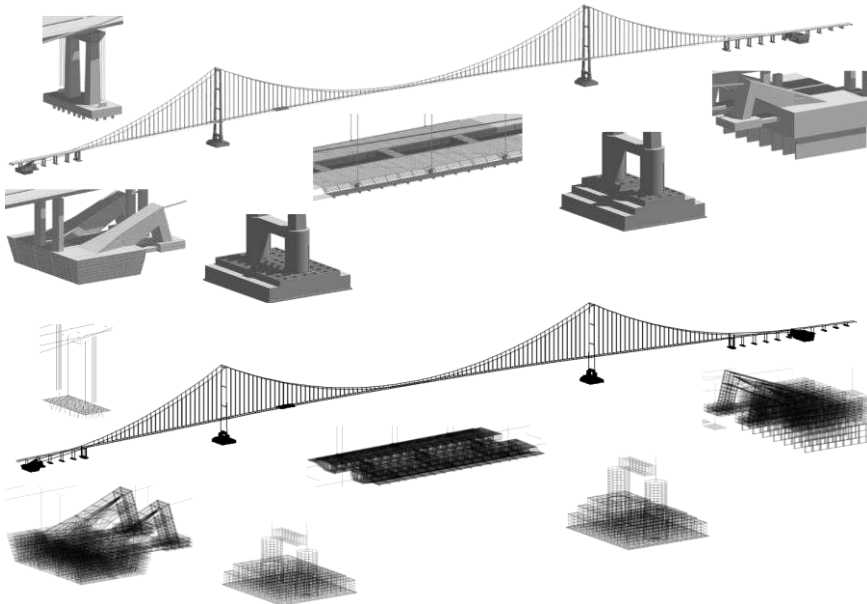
IBDAS FE-models; Semi-local models activated at anchor blocks, tower foundations and bridge deck.
